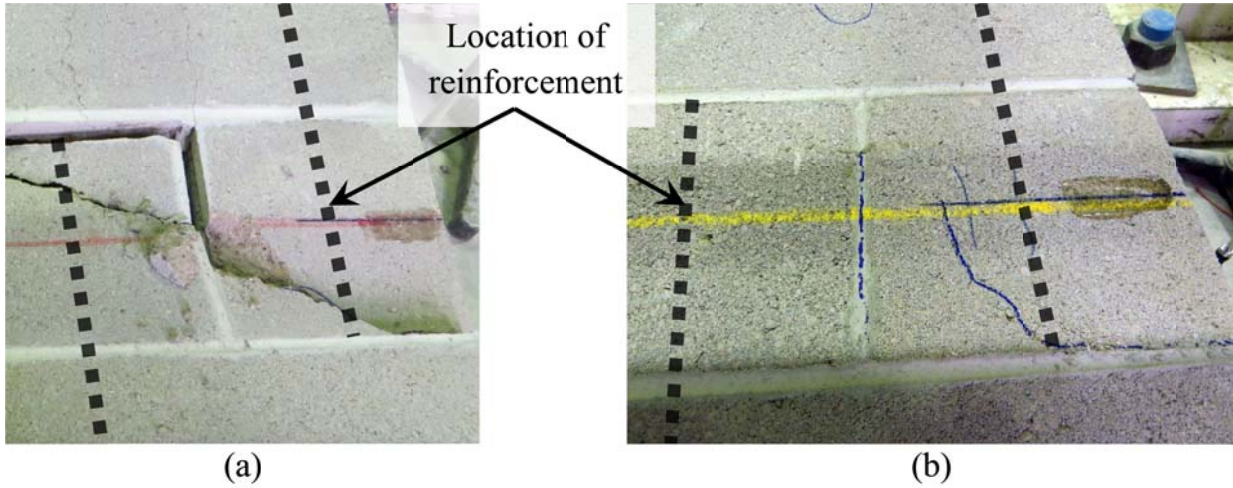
Typical Midspan Crack Pattern on the Compression Face at Failure: (a) NCLS, and (b) 1KO and 3KO Wall Splice Specimens.
